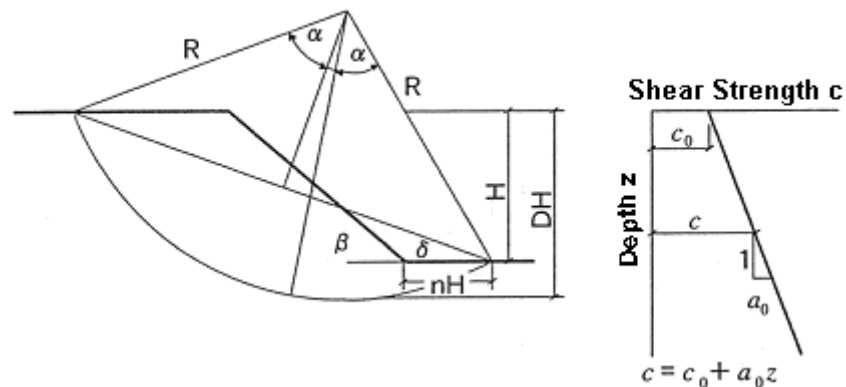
Typical Section of Slope (Koppula, 1984)
